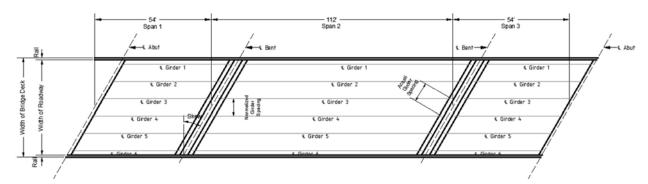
Top View of the 45 Degrees Skewed ITBC with Spans and Girders
